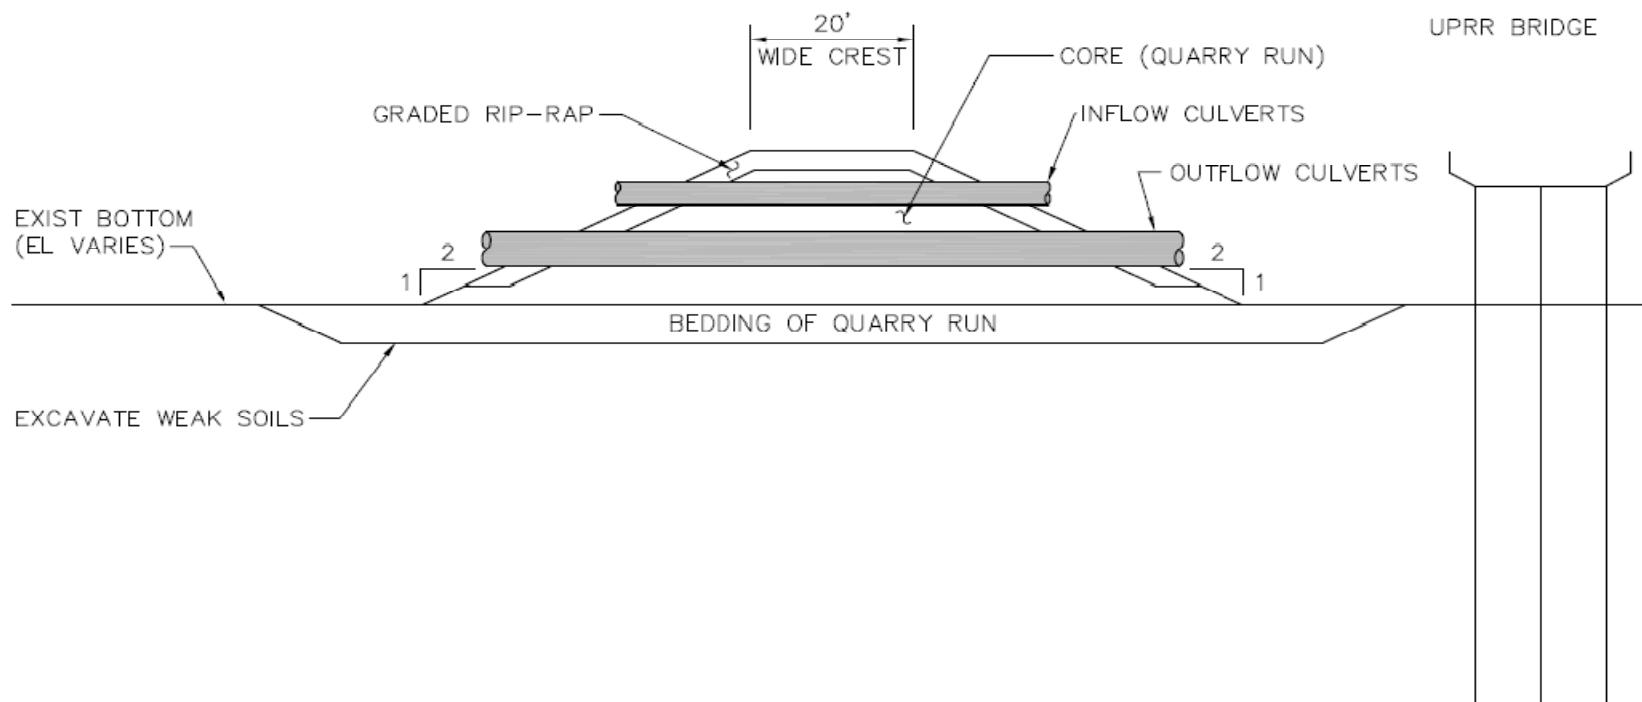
Concept Plan of the Structure (Inset 1)
